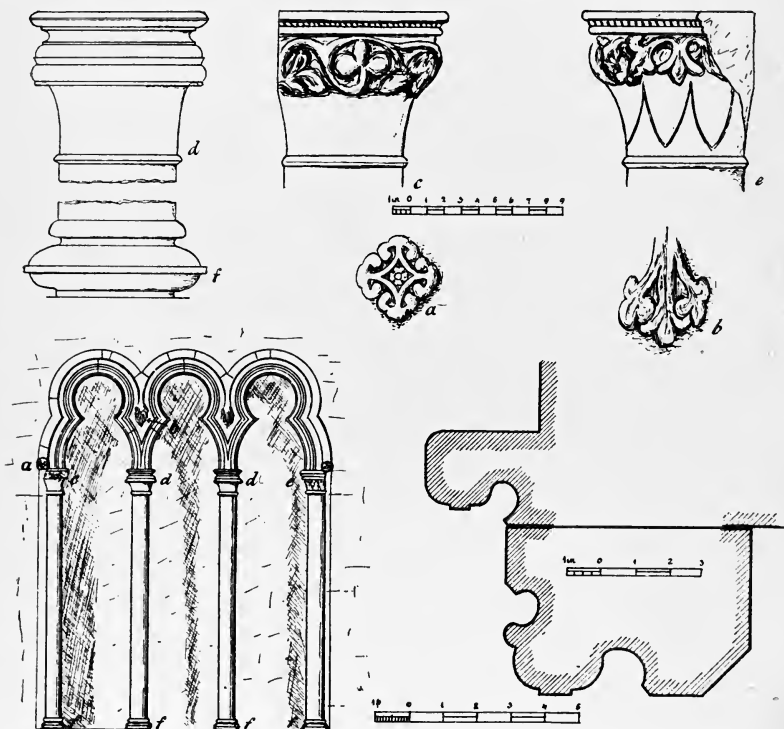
TOMB ARCADE IN NAVE: ELEVATION AND DETAILS
